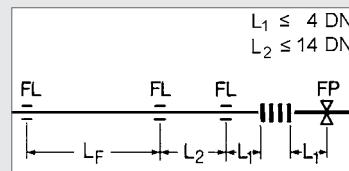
Spacing of guides in pipes with axial expansion joints
